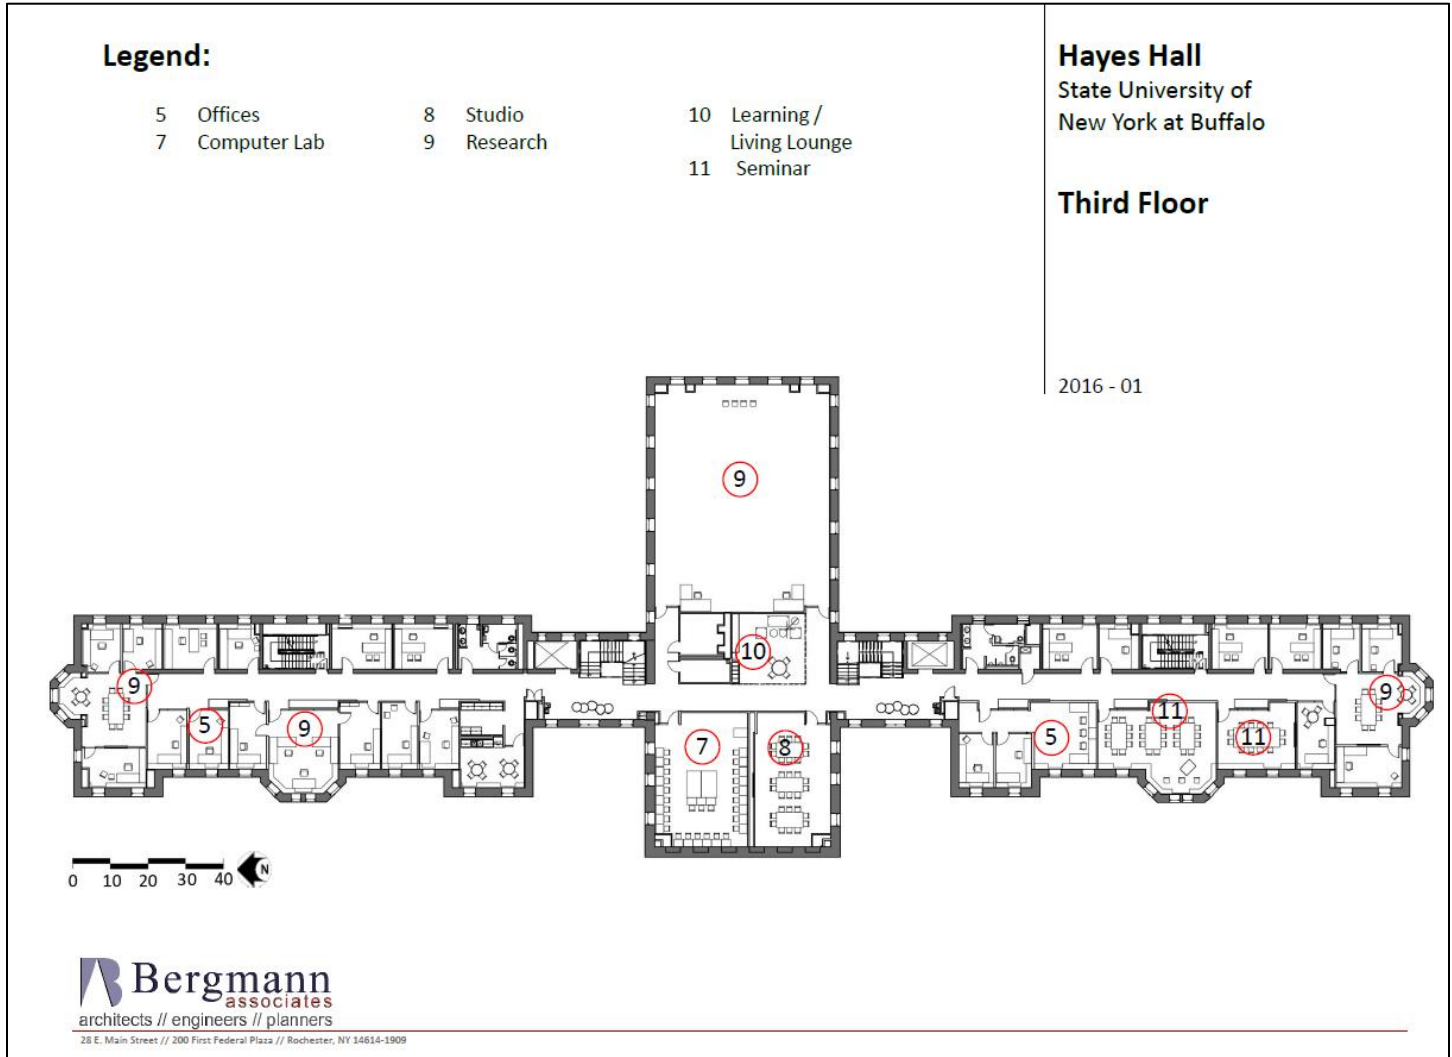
Third floor plan of Hayes Hall showing current floor plan of building.
